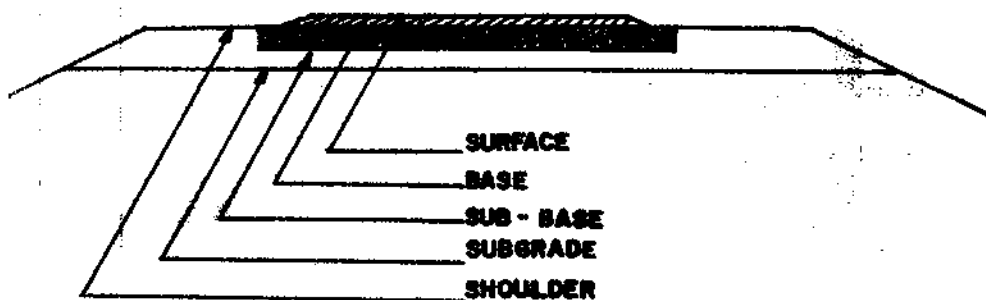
CROSS SECTION OF ROAD PAVEMENT
